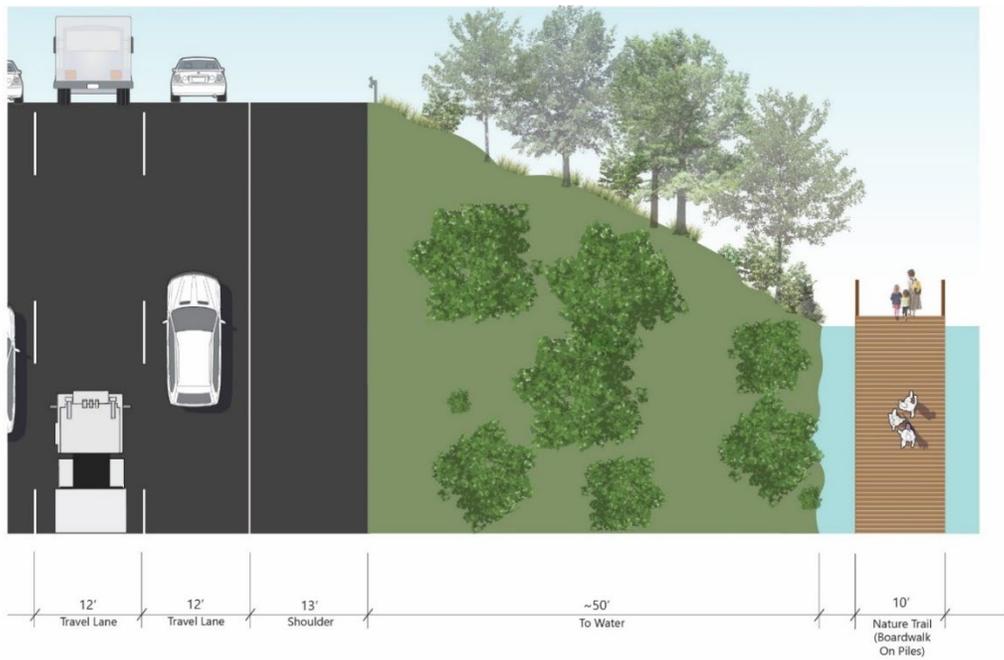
Section H-4 (facing north): Proposed Option 3: Off-shore Boardwalk Structure on Piles
